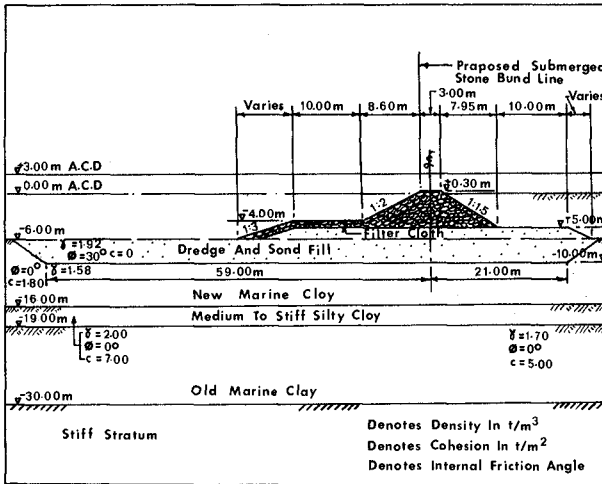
TYPICAL SECTION OF SUBMERGED STONE BUND
